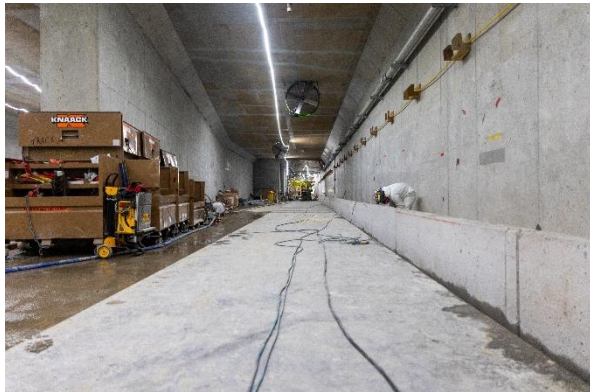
Arbutus Station: Progressing with the walkway walls in the crossover box.
